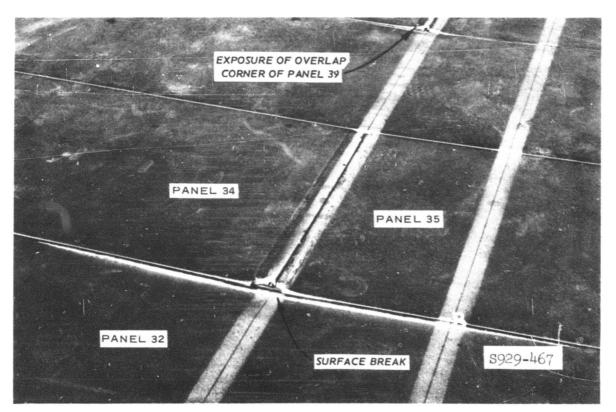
Break on surface of XM20El panel 32 after 780 coverages (failure)
